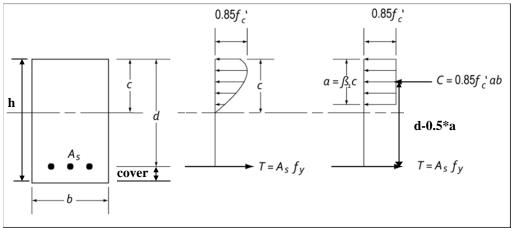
Whitney rectangular idealization of a reinforced concrete beam.
